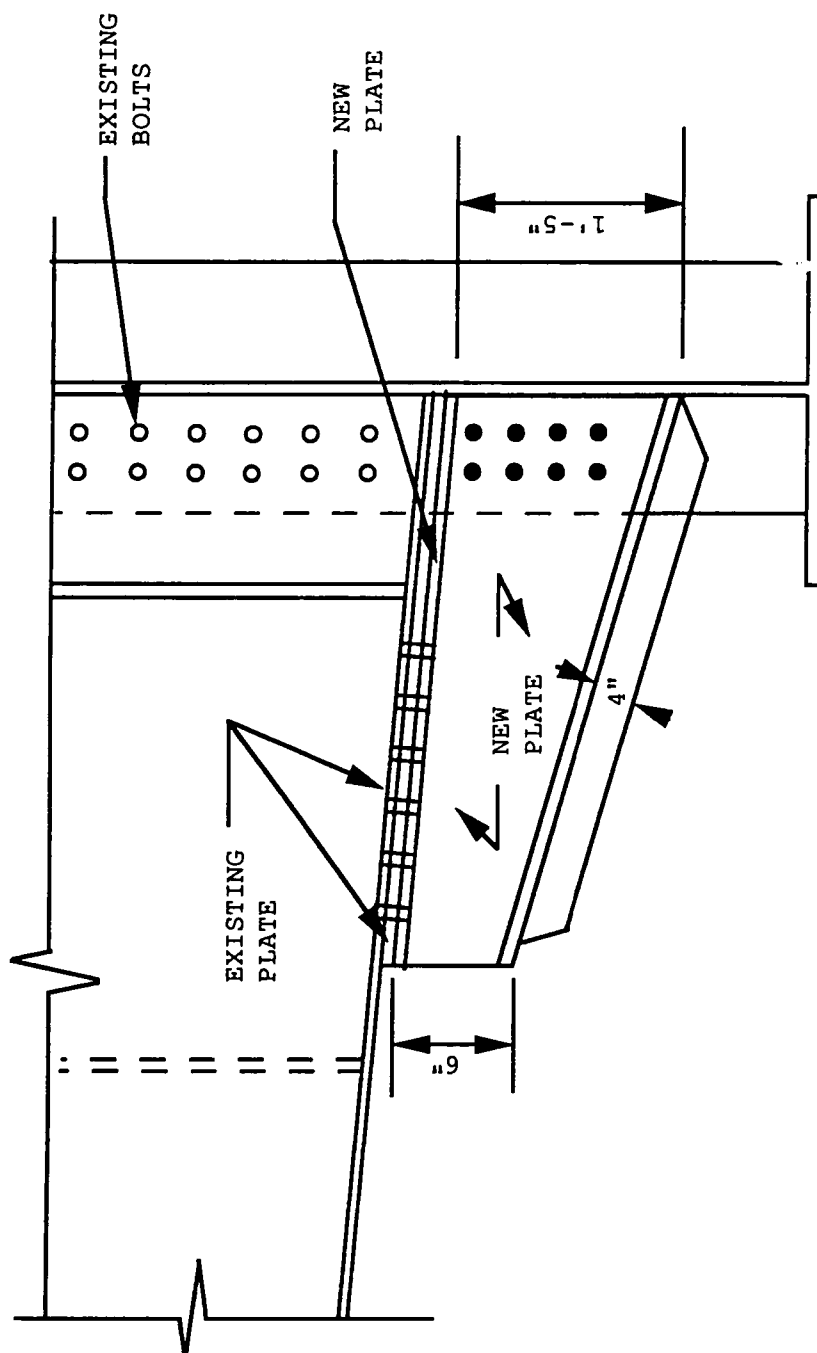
Cantilever to Girder Connection with Retrofit Plate in Place
